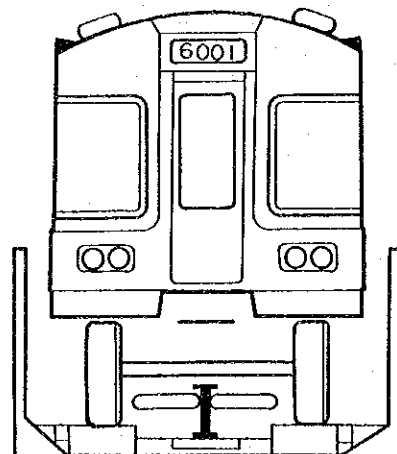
Cross Sectional Outline of Rubber Tire Railway
